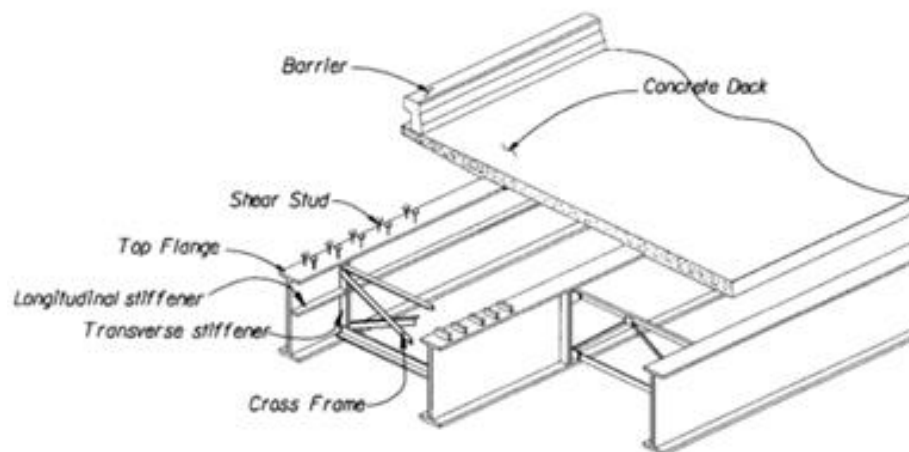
Typical components of I-girder composite bridges (Saleh & Duan, 2000).
